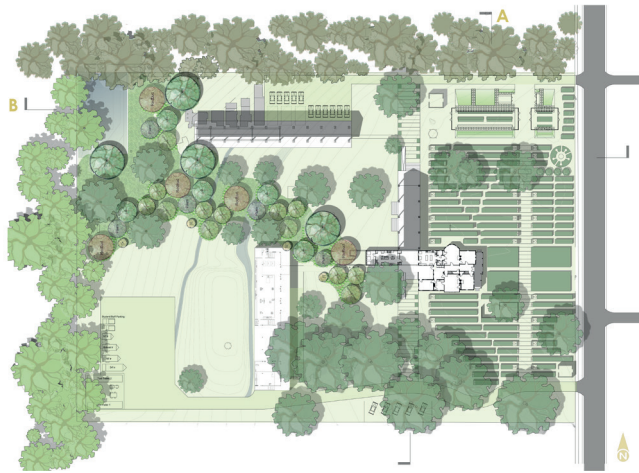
Rural Studio Farm Layout Plan and farming organization © Rural Studio, 2010
